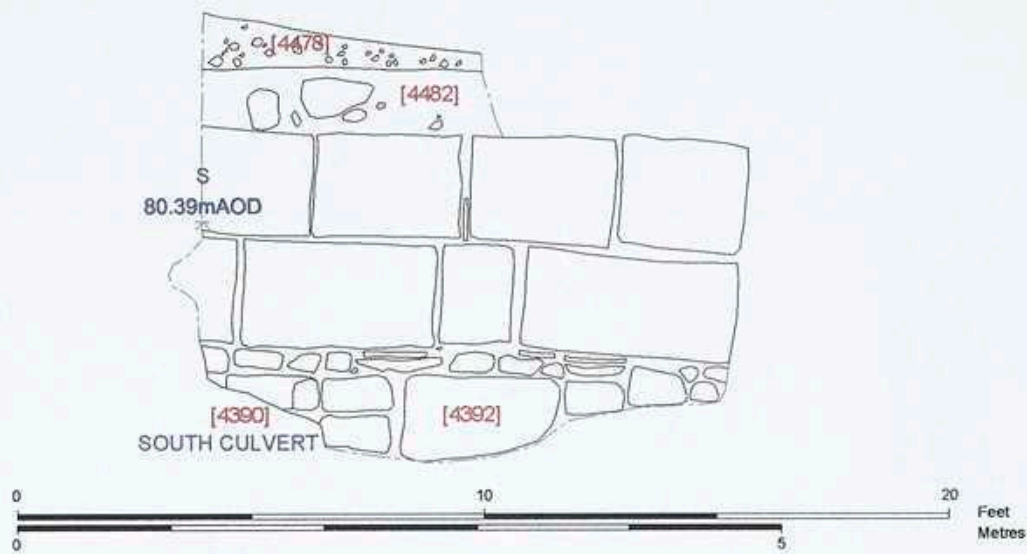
Trench 44, East facing elevation of wall [4468]. Scale (1:50).
